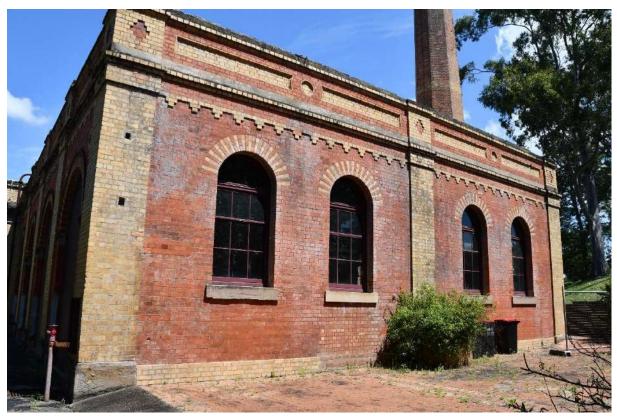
Northern elevation of Boiler Room (Item B). Evidence of the attachment of the former Addition (Item G) can be seen on the corner in the foreground and below the window frame where the brick work has been replaced.
